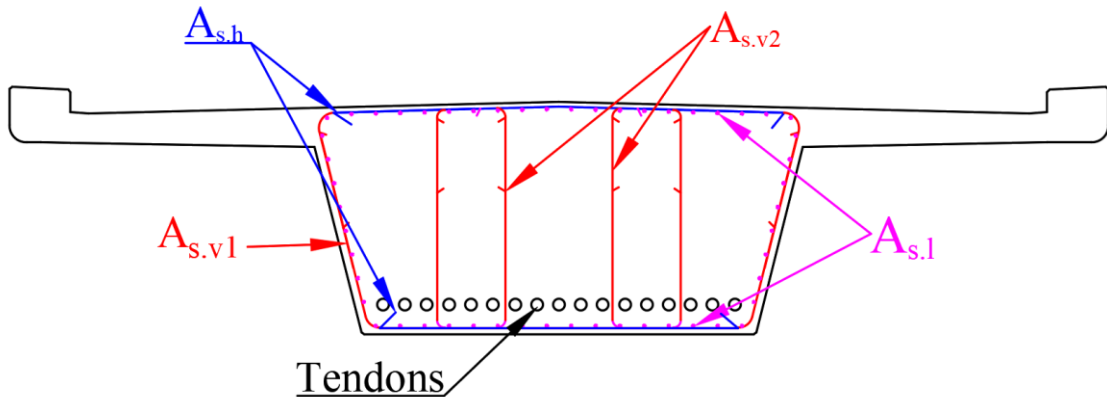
Reinforcement types in the span cross section of the bridge beam.
